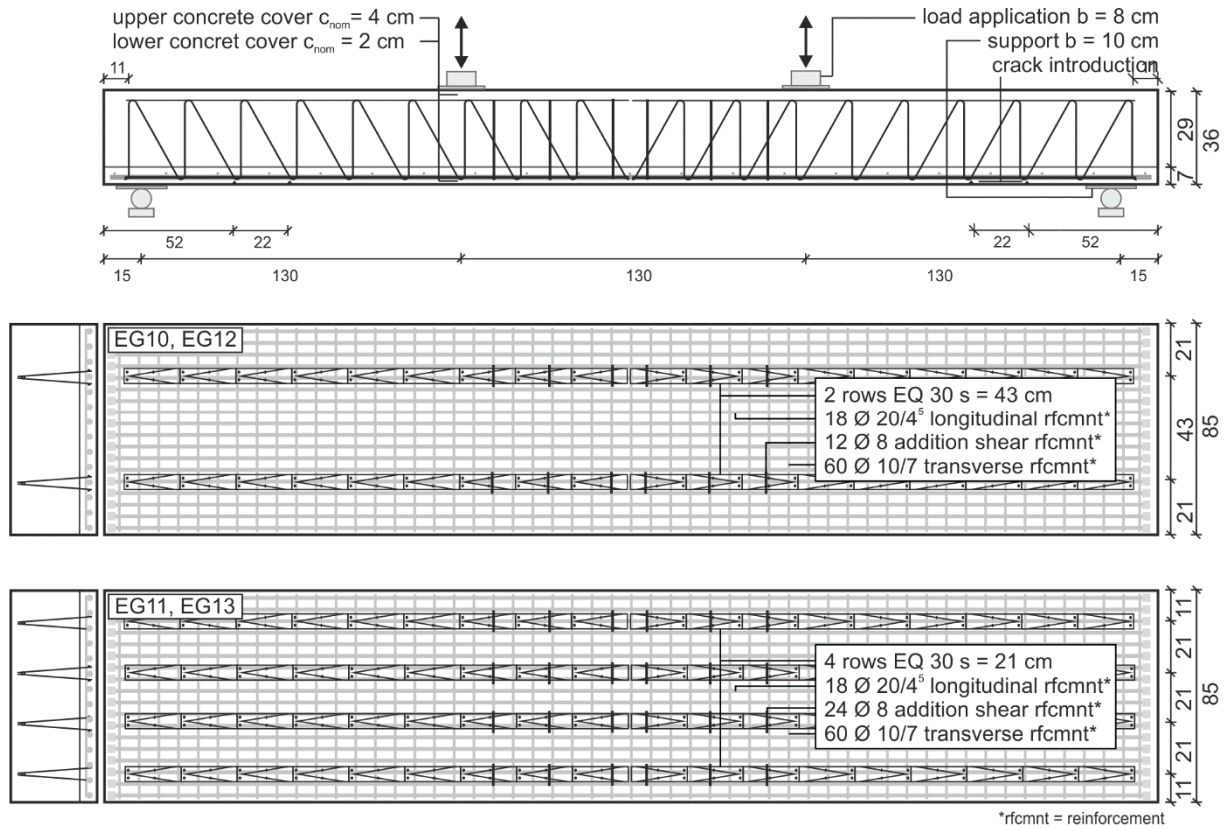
Reinforcement and formwork detail of specimens EG10, EG11, EG12 and EG13
